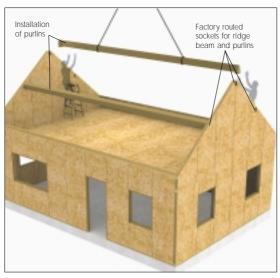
INSTALLING RIDGE BEAMS/PURLINS
